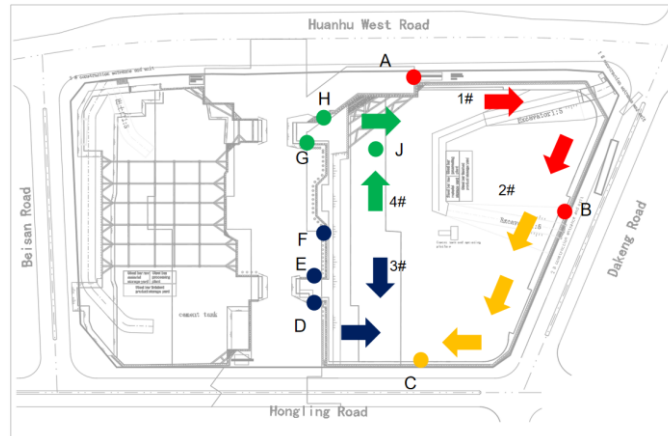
Construction Sequence of Foundation Pit Support of 5# Basement
